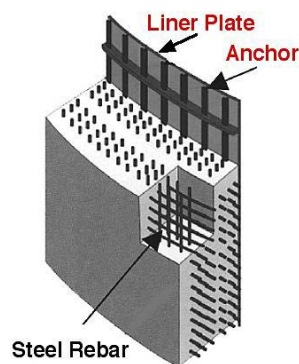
Containment Cross Section schematic (tendons not depicted) [2]
